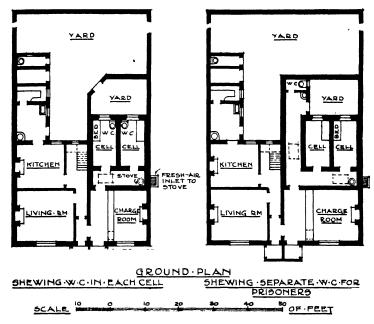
(above). Plan of small police station showing alternative arrangement of sanitary conveniences (Home Office model).
